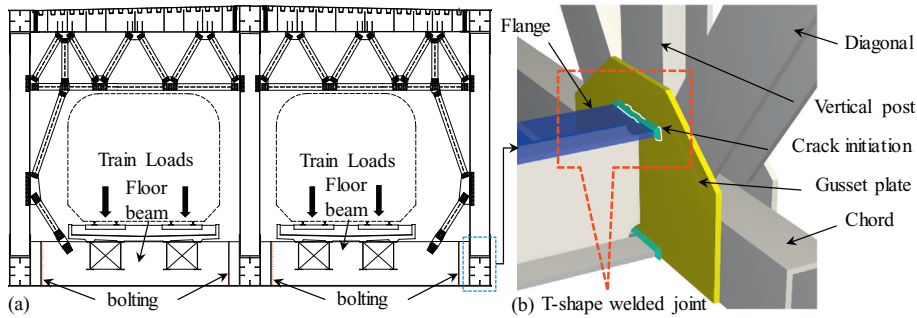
Sketch of welded joint: (a) the cross-section; (b) the truss joint.
